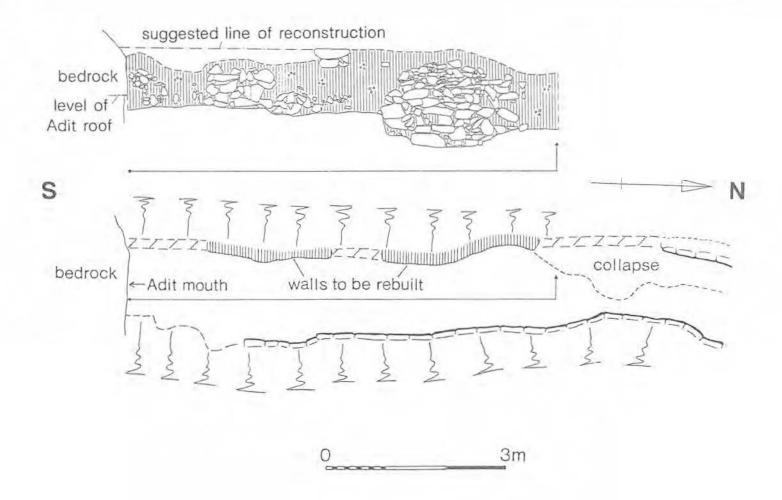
Adit E26 - plan and elevation showing position of replaced stones
